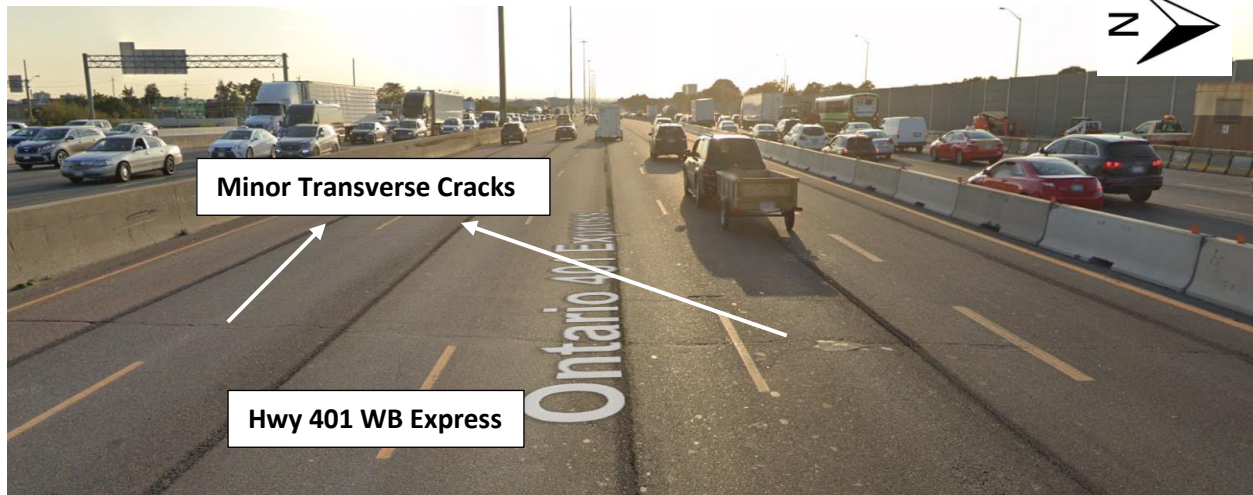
Looking towards West : Dufferin Street Overpass (November 2019)
